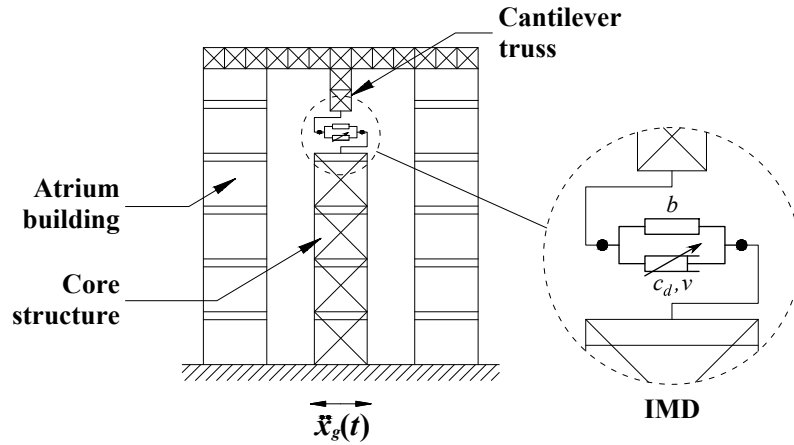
Atrium building with a truss-IMD-core structure system.
